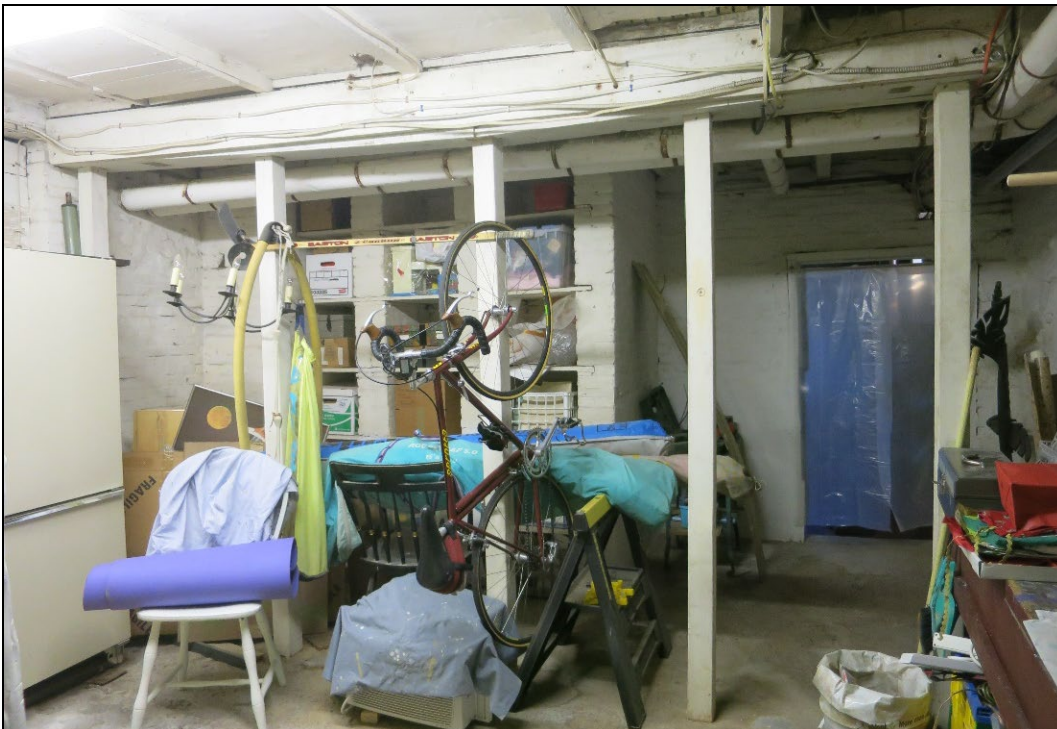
Basement, west side, shelving in east chimney base & doorway to east side. Carrying beam for partition between sections above.
